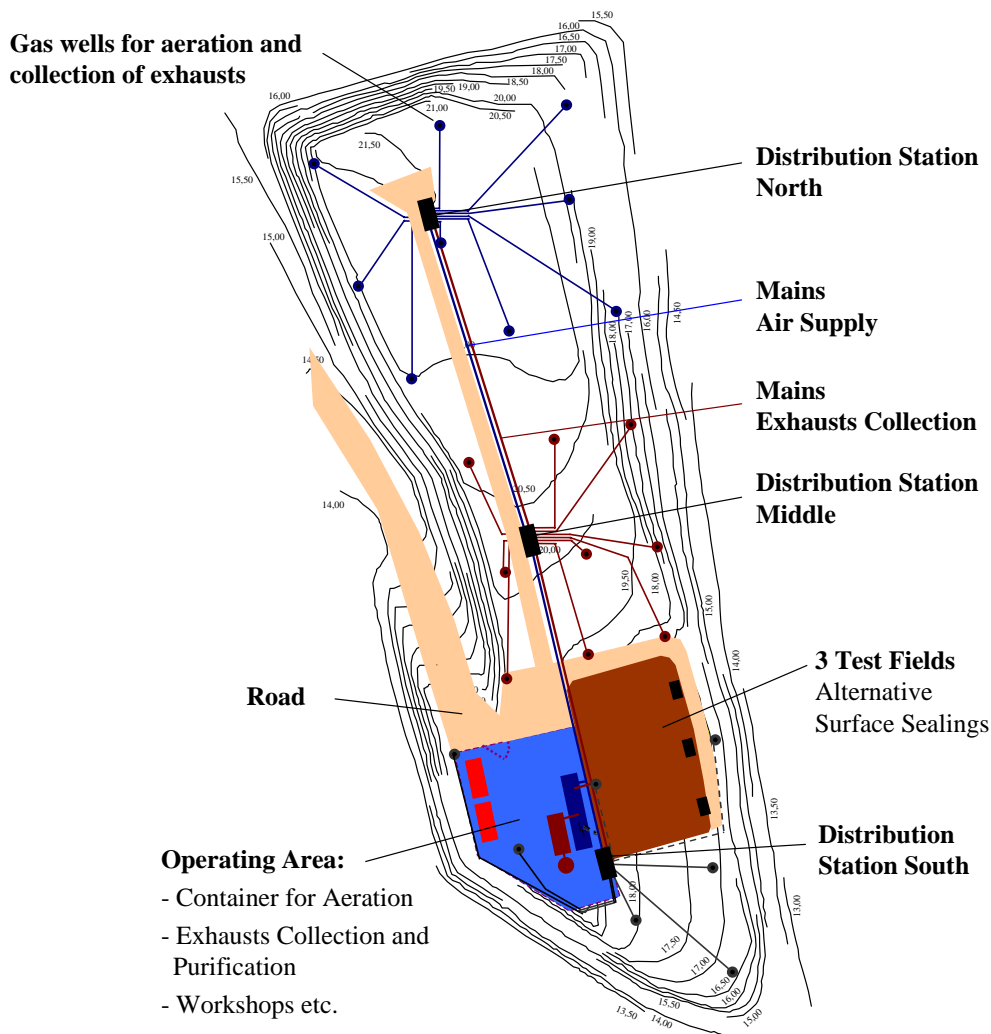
Master plan of the installations for an in situ stabilization of the old landfill in Kuhstedt (Heyer et al., 2000)
